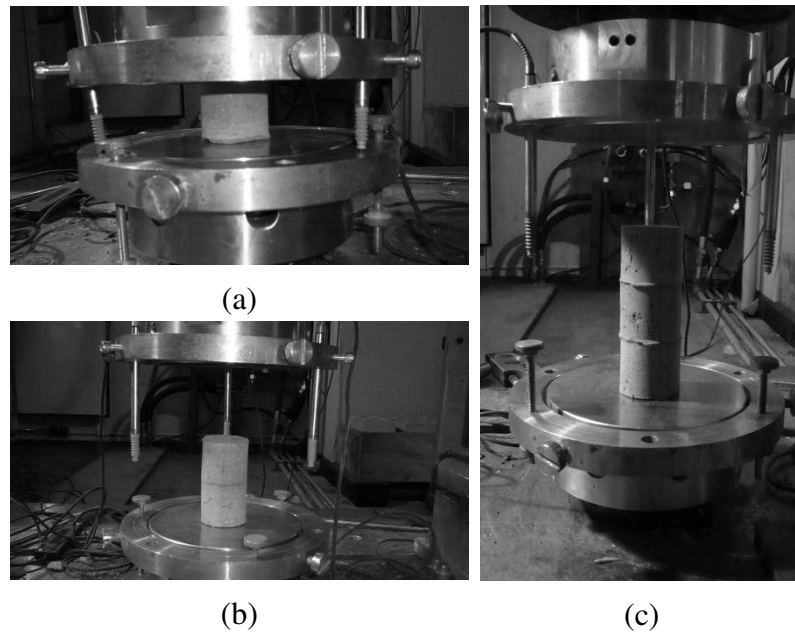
Test and measurement layout for compressive tests on brick cylinders: (a) single, (b) double and (c) triple samples.
